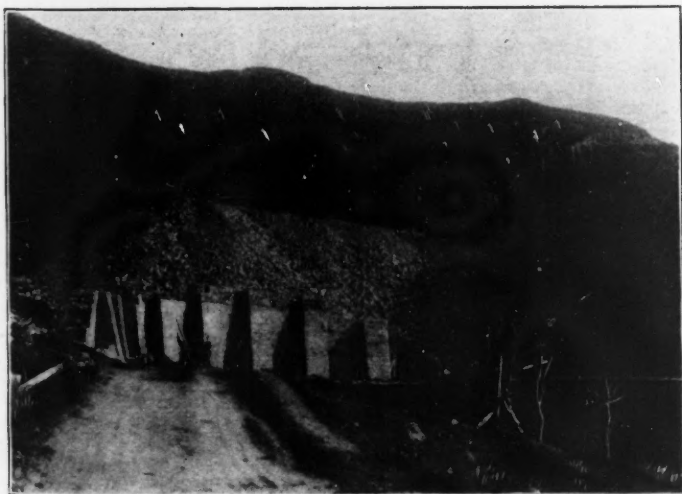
RETAINING WALL FOR DEEP FILL AT POLNISH.
